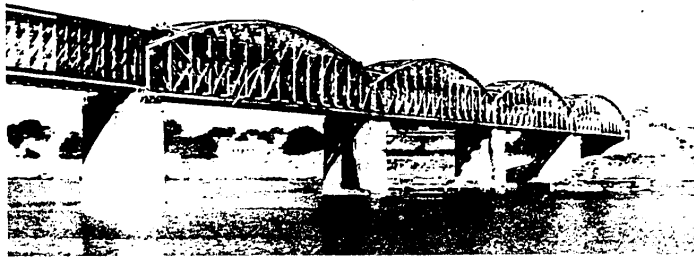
Malaviya Bridge. Rail-highway structure over the Ganges at Benares (C)
